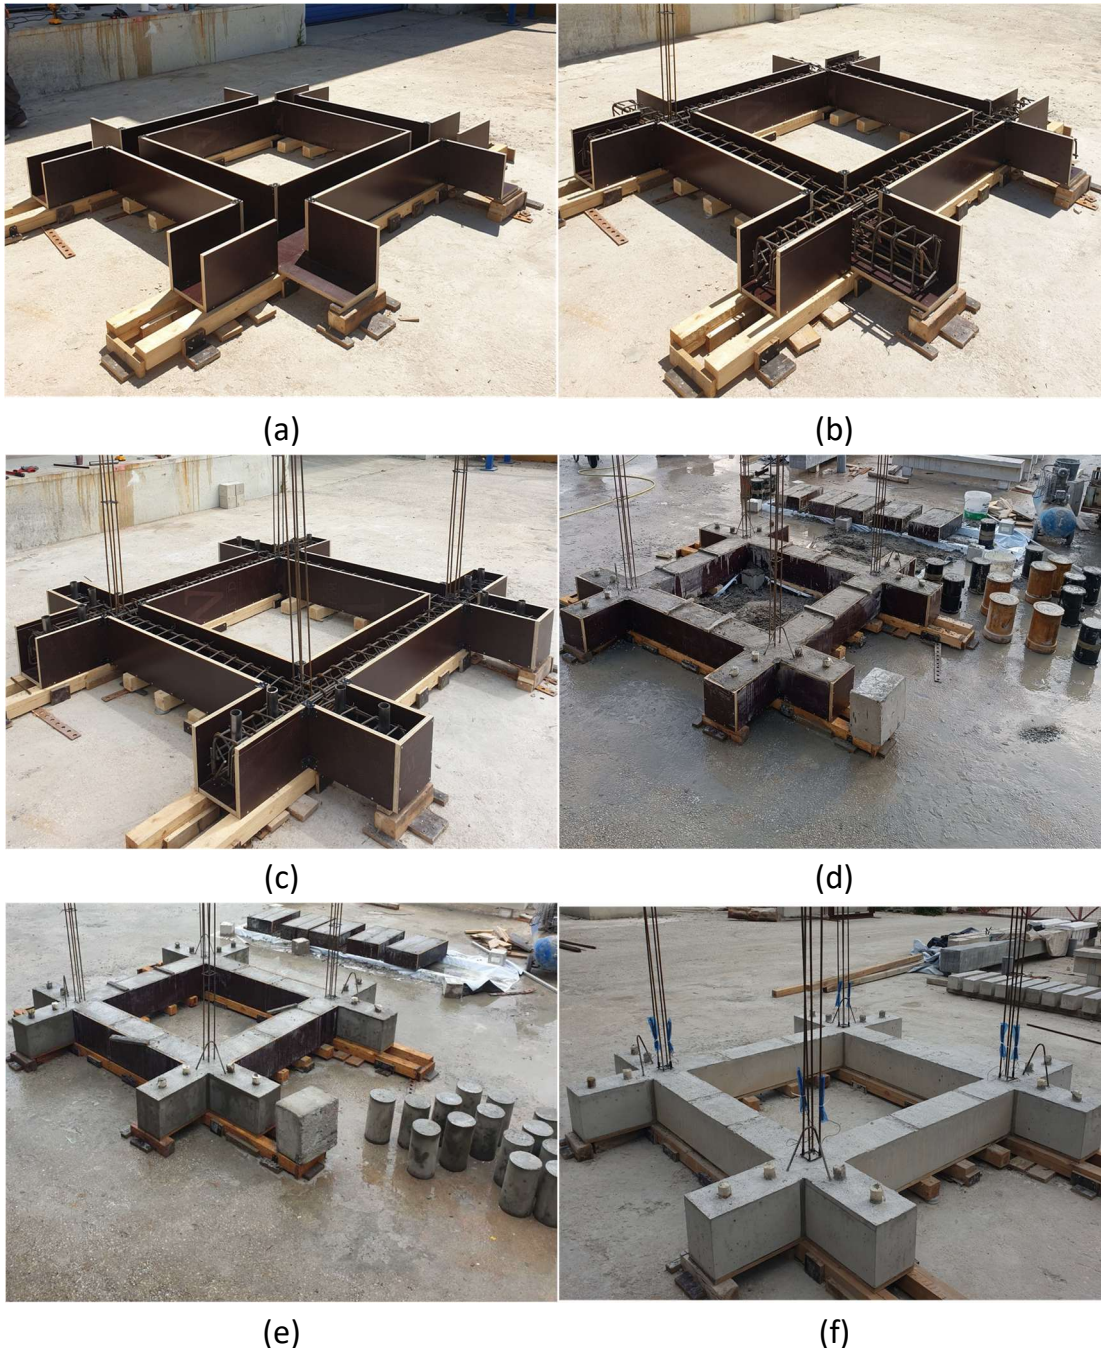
Construction of the foundation of the specimen: (a) formwork construction, (b) installation of foundation beam reinforcement, (c) installation of longitudinal reinforcement for columns and pipes to create connection holes (for attachment to the seismic table), (d) concrete casting, (e) partial removal of the formwork, and (f) specimen's base after concrete hardening and complete formwork removal.
